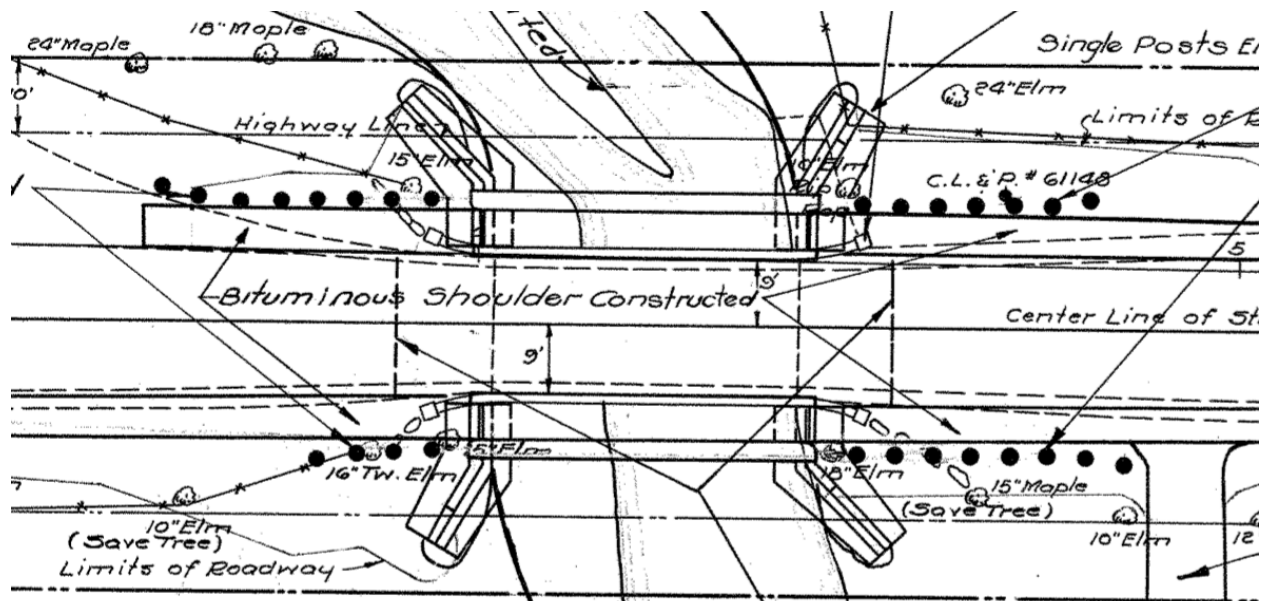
Plan view. Source: Connecticut State Highway Department Plan for Construction of Widening...,” 3.
